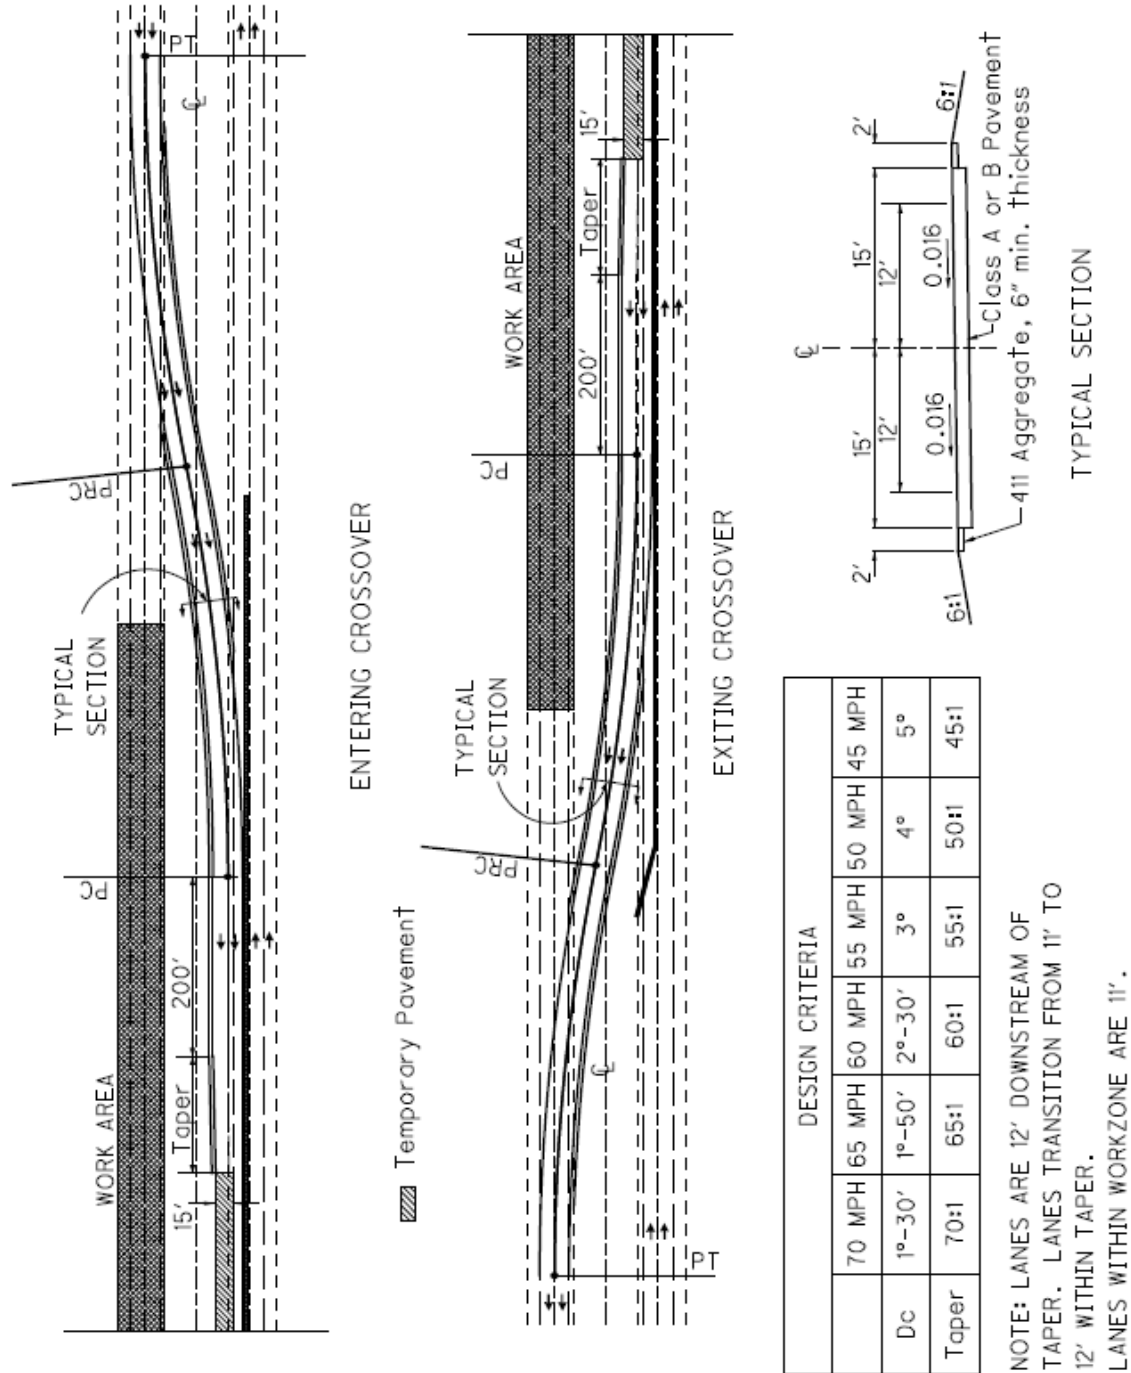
Example Typical Sections (Existing 4-Lane Facility)
